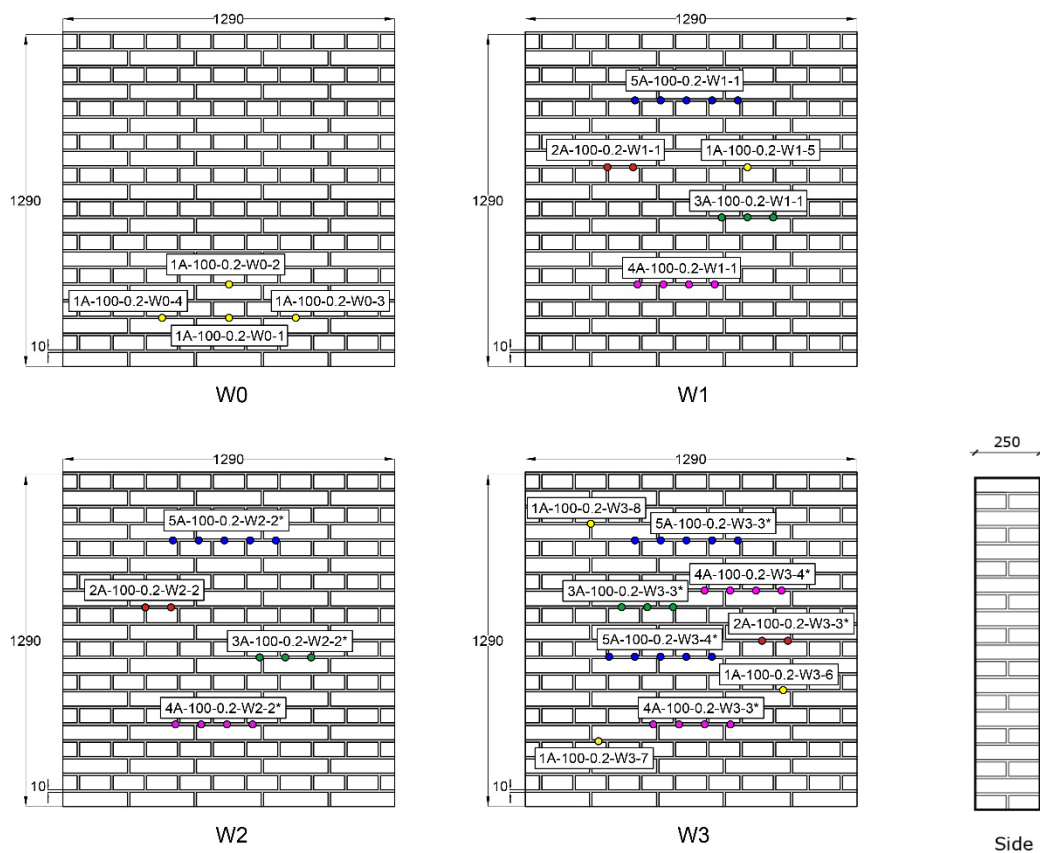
Sketch of masonry specimens with the position of the tested anchors.
